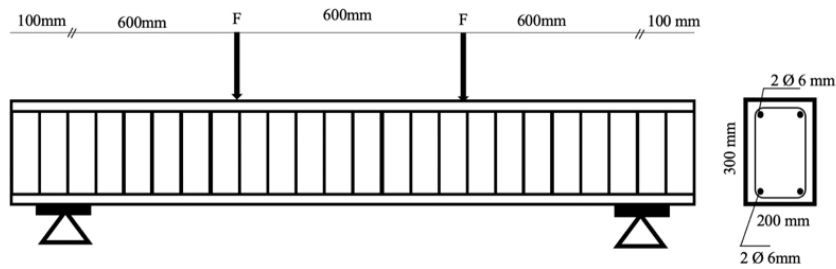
Schematic of reinforced concrete beam under the four-point bending experiment with the dimensions of the bars and stirrups inside the beam.
